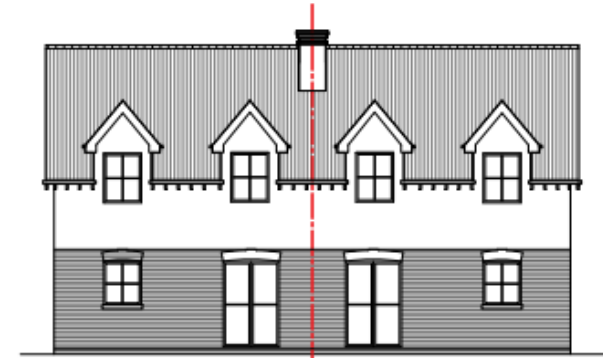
DETAILED PLANNING CONSENT FOR THE ERECTION OF A TWO STOREY END OF TERRACE HOUSE AND TWO SEMI-DETACHED CHALET STYLE DWELLING HOUSES RETAINING THE EXISTING DWELLING HOUSE
